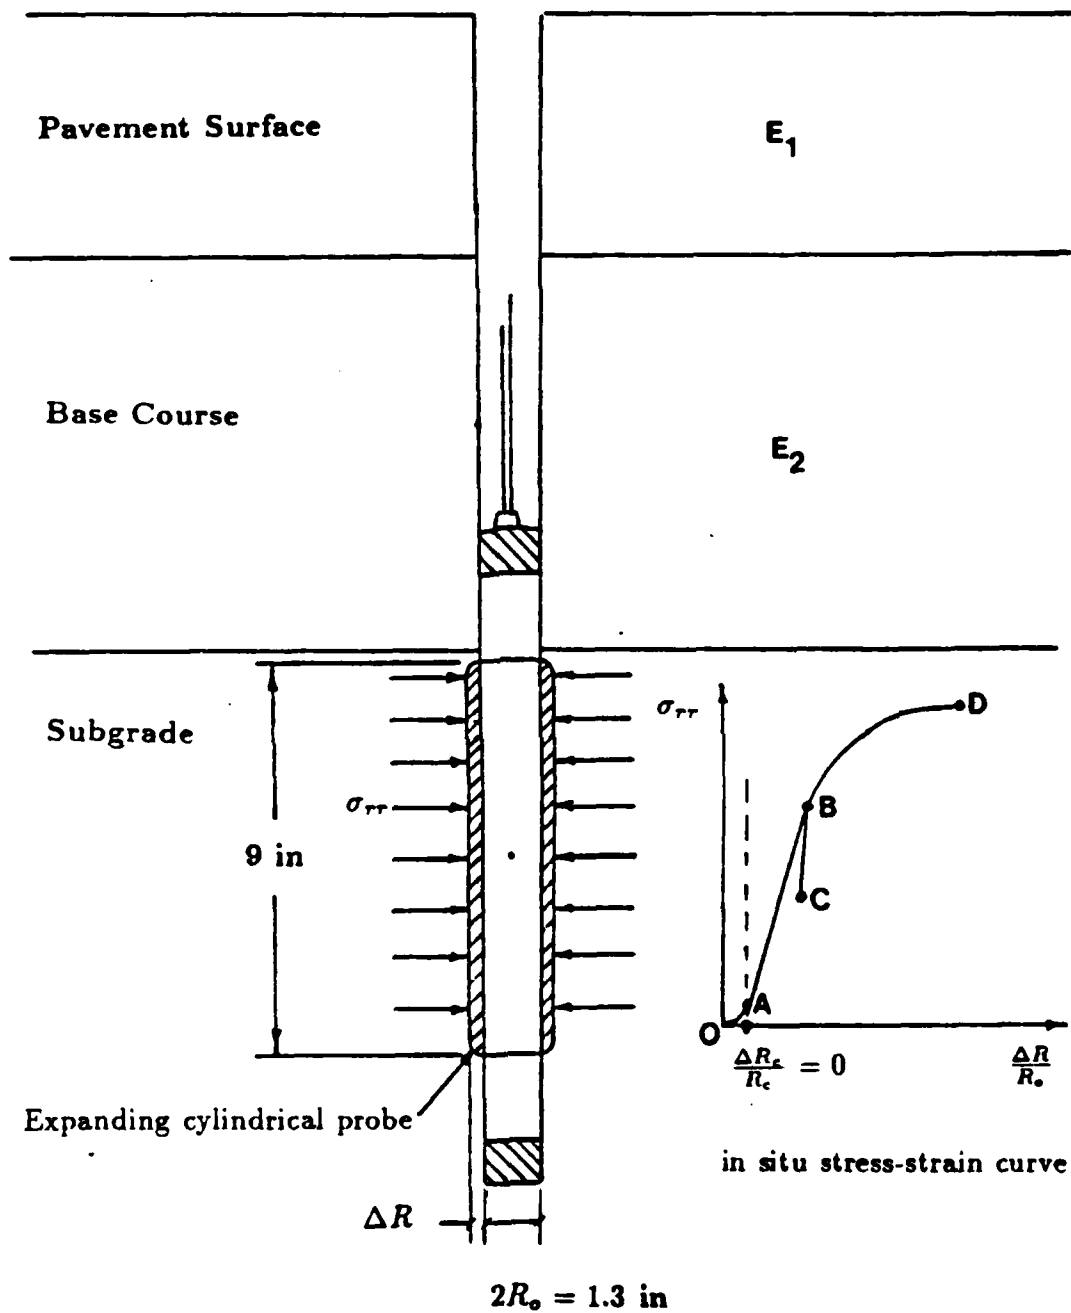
Typical Pavement Pressuremeter Test and Pavement Cross Section
